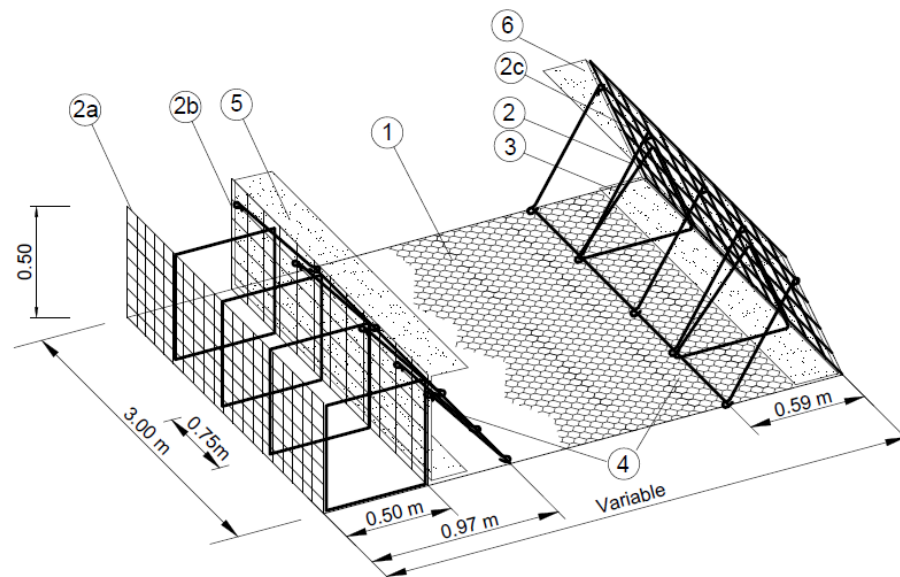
Example of steel reinforcement system with facing unit type III
